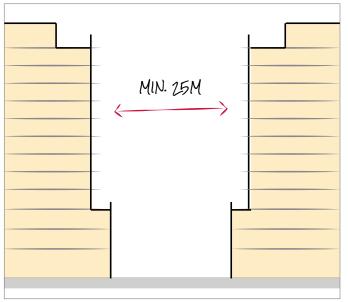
Provide separation distance between towers on the same site of 25m or greater (5.1.3 c).
